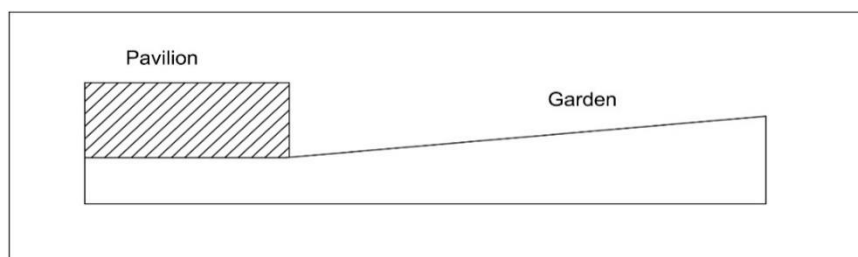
Diagrammatic position of the garden and pavilion in Pasargadae gardens ( Author 2015)
